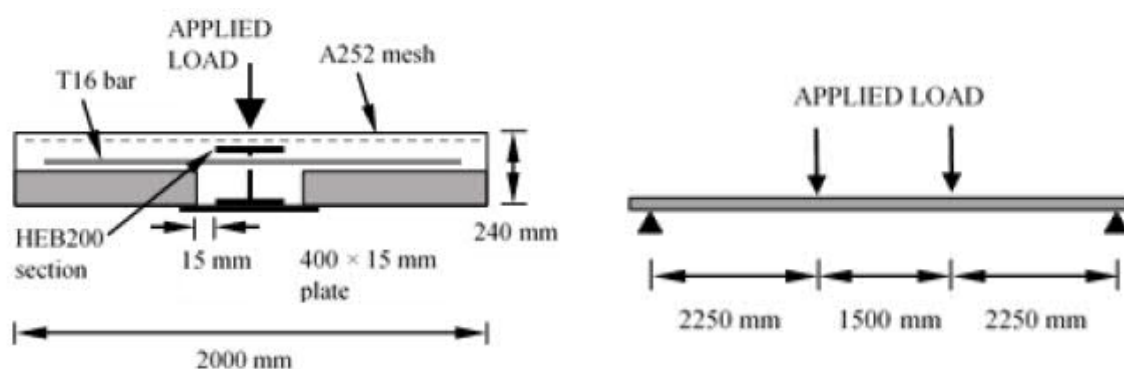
Cross-section (left) and side (right) view of typical specimen
